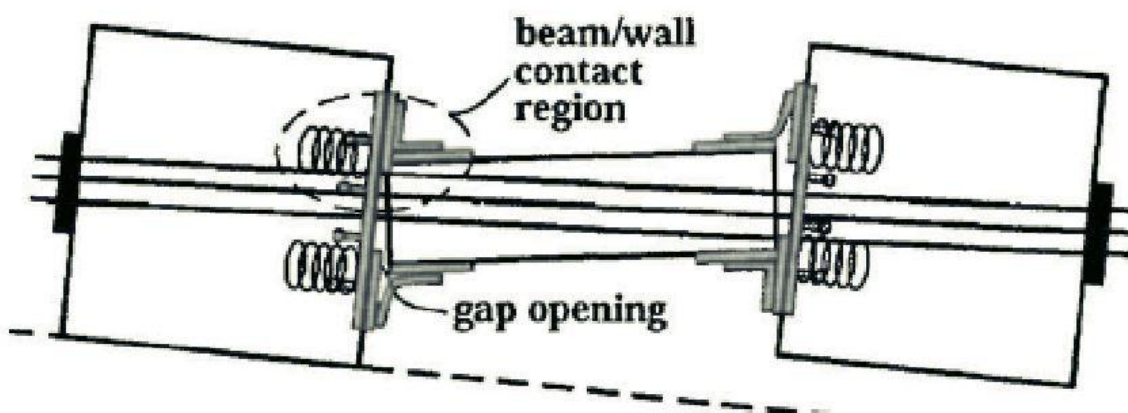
Application of post-tensioned cables for connecting concrete shear walls (Kurama, 2006)
